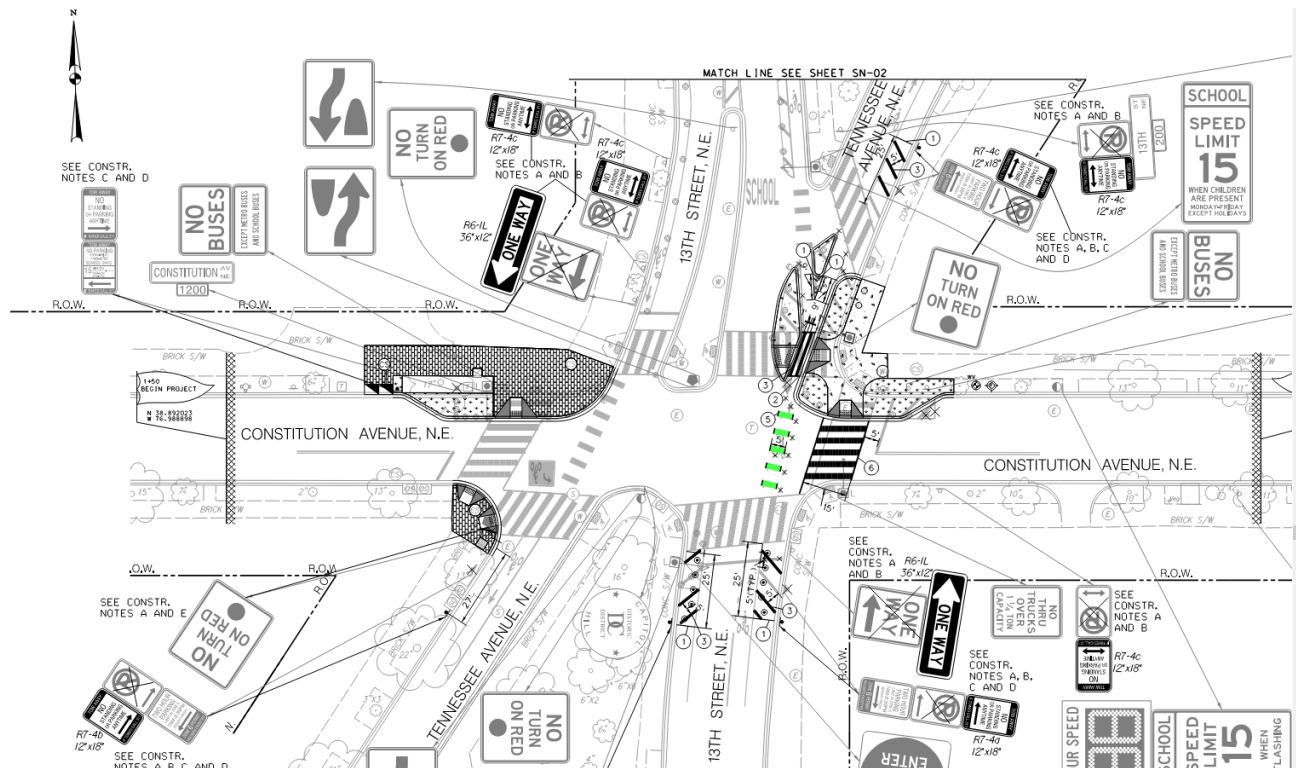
Proposed curb extensions and green space 13th St/Constitution Ave/Tennessee Ave NE Intersection
